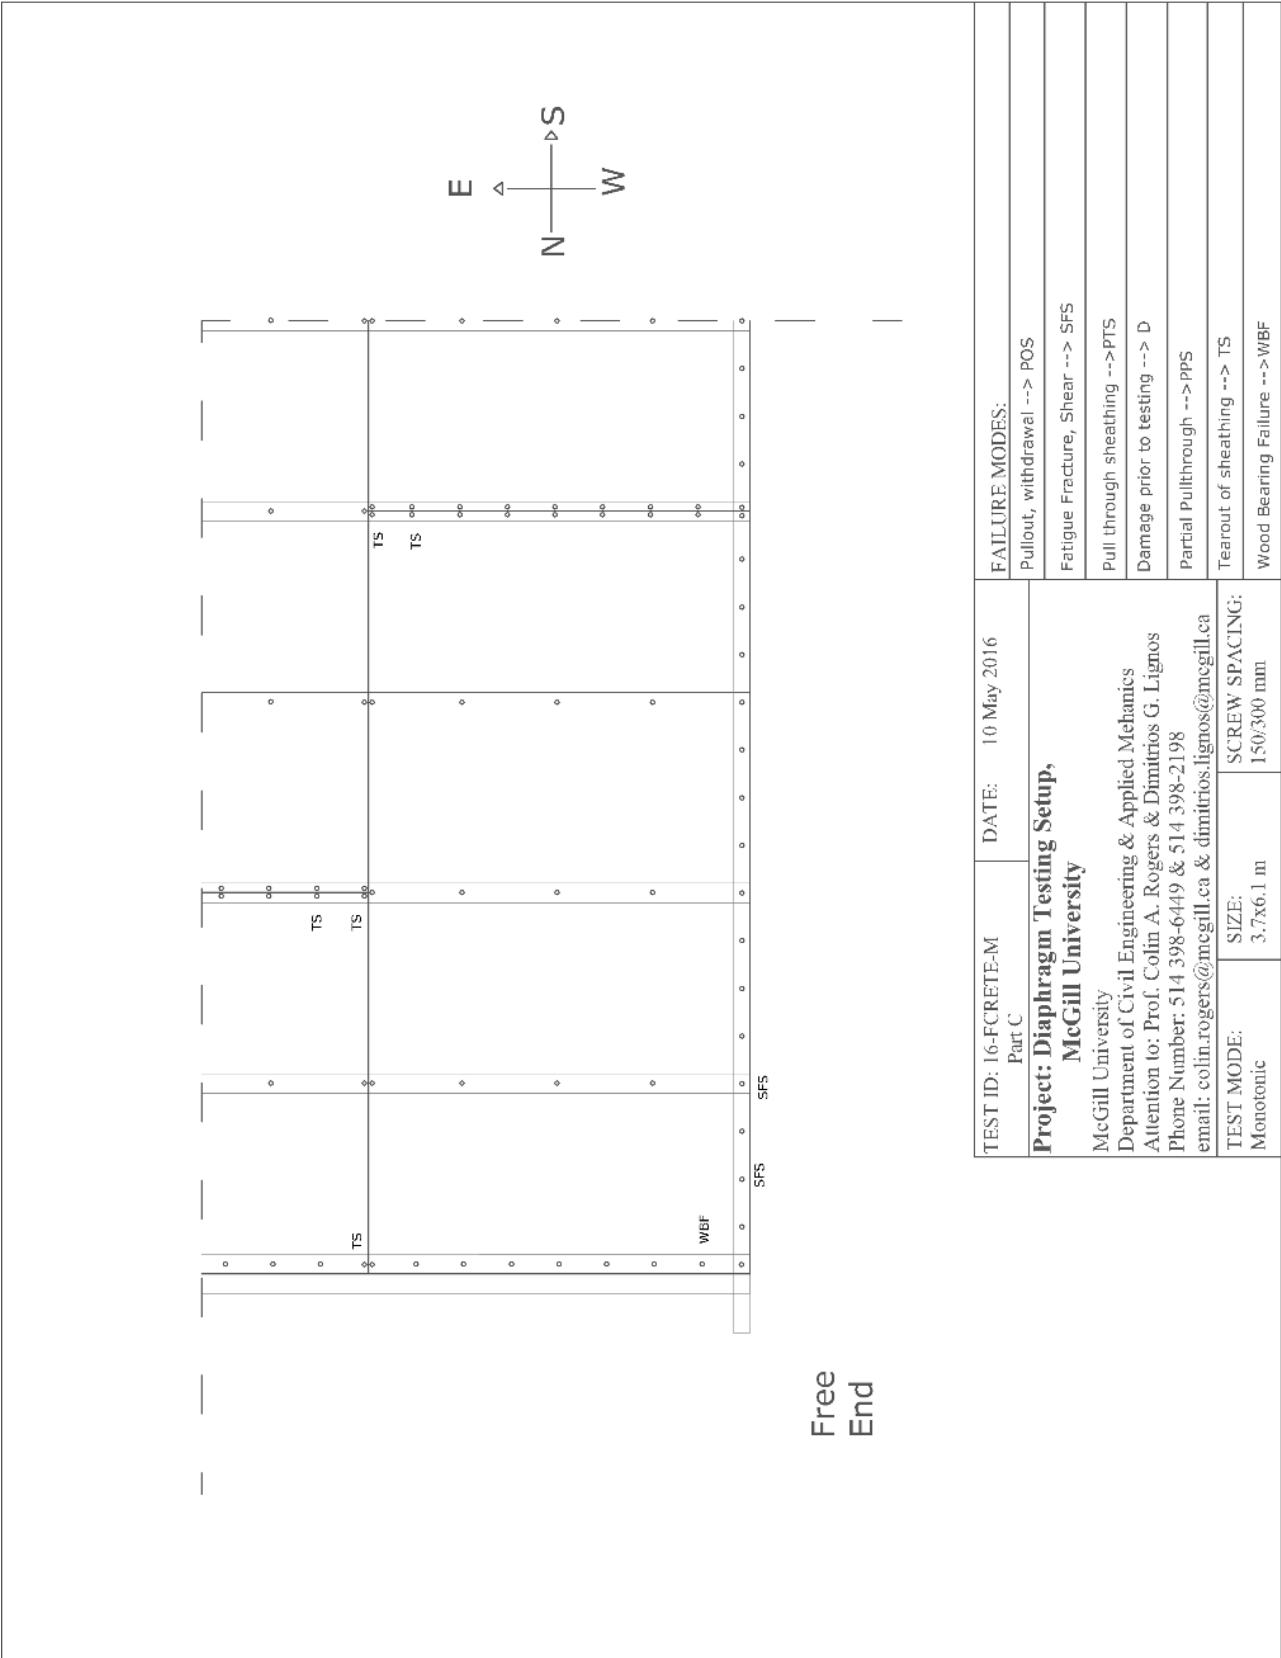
Sheathing Fastener Failure Modes Part C Specimen 16-FCRETE-M
